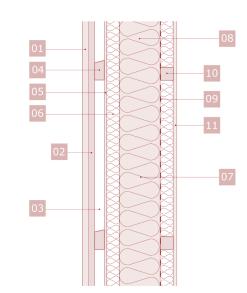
Example of a wooden building. (picture redrawn from Träguiden 2019)
